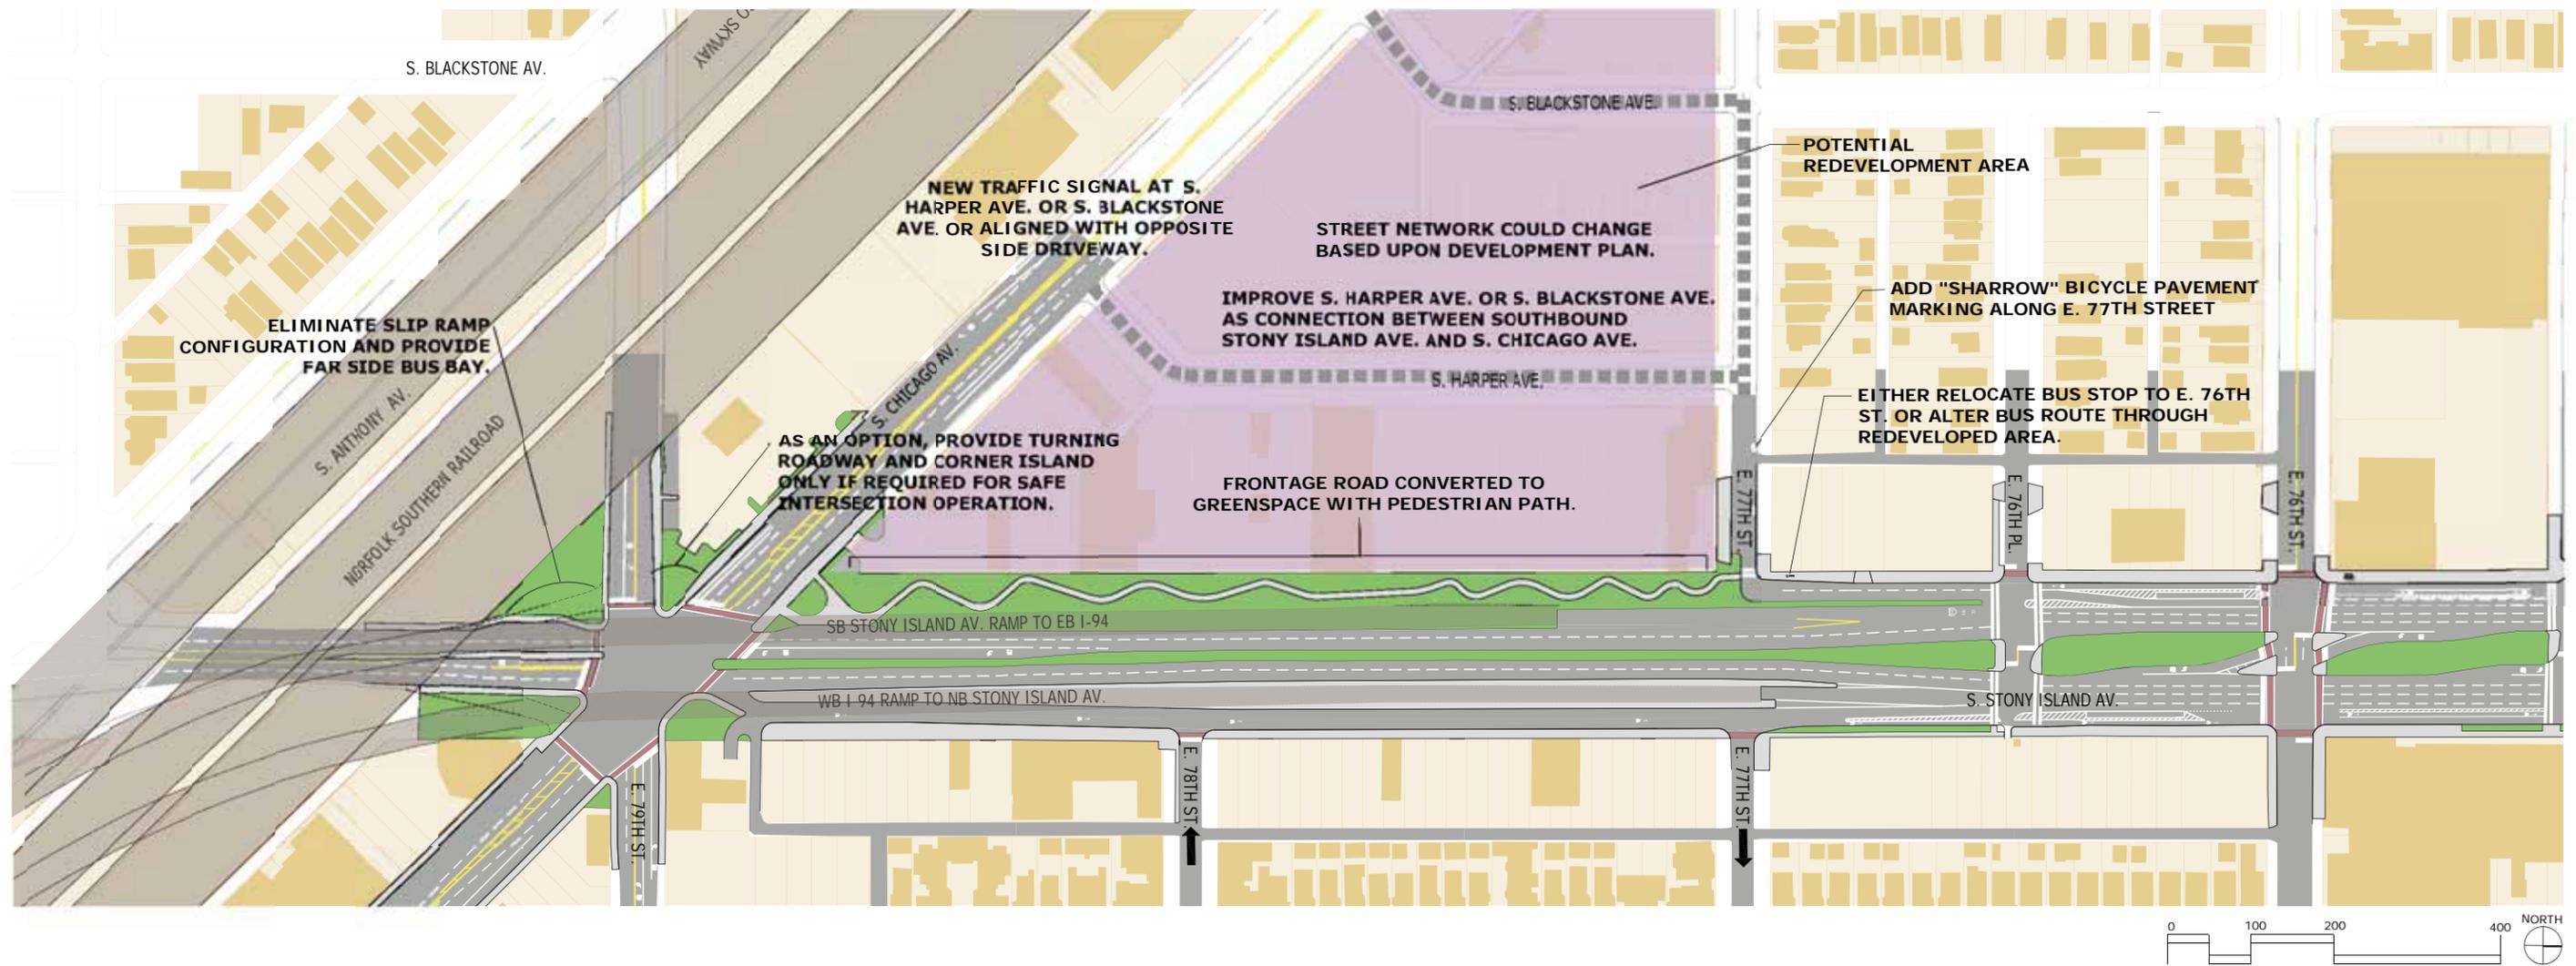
E. 79th Street Intersection Improvements - Long Term
